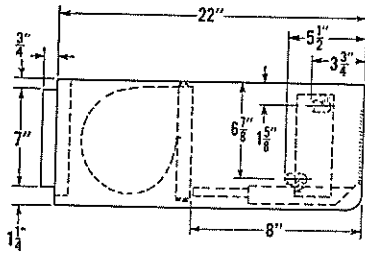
Dimension Drawing of UniTrane Horizontal Cabinet Model.
